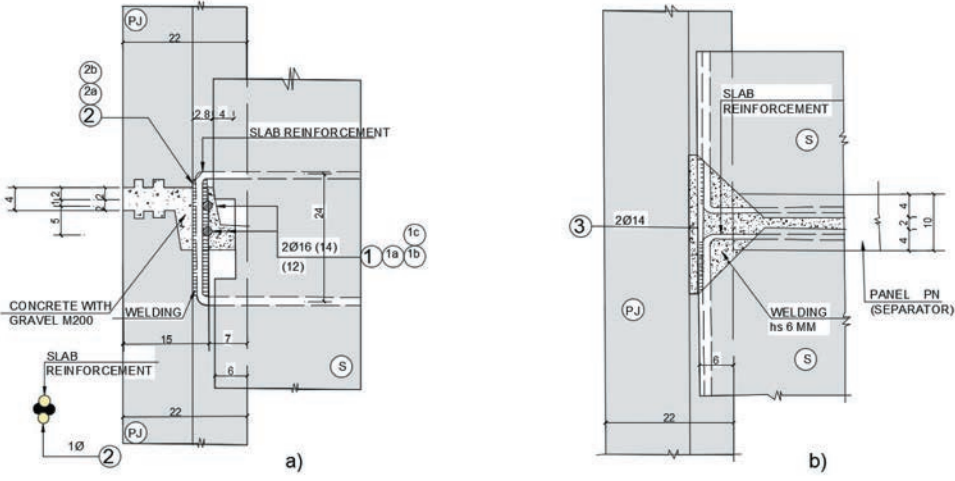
Floor-wall connection: a) connection between the floor slab and two adjacent wall panels (horizontal section) and b) floor-to-wall connection (horizontal section).
